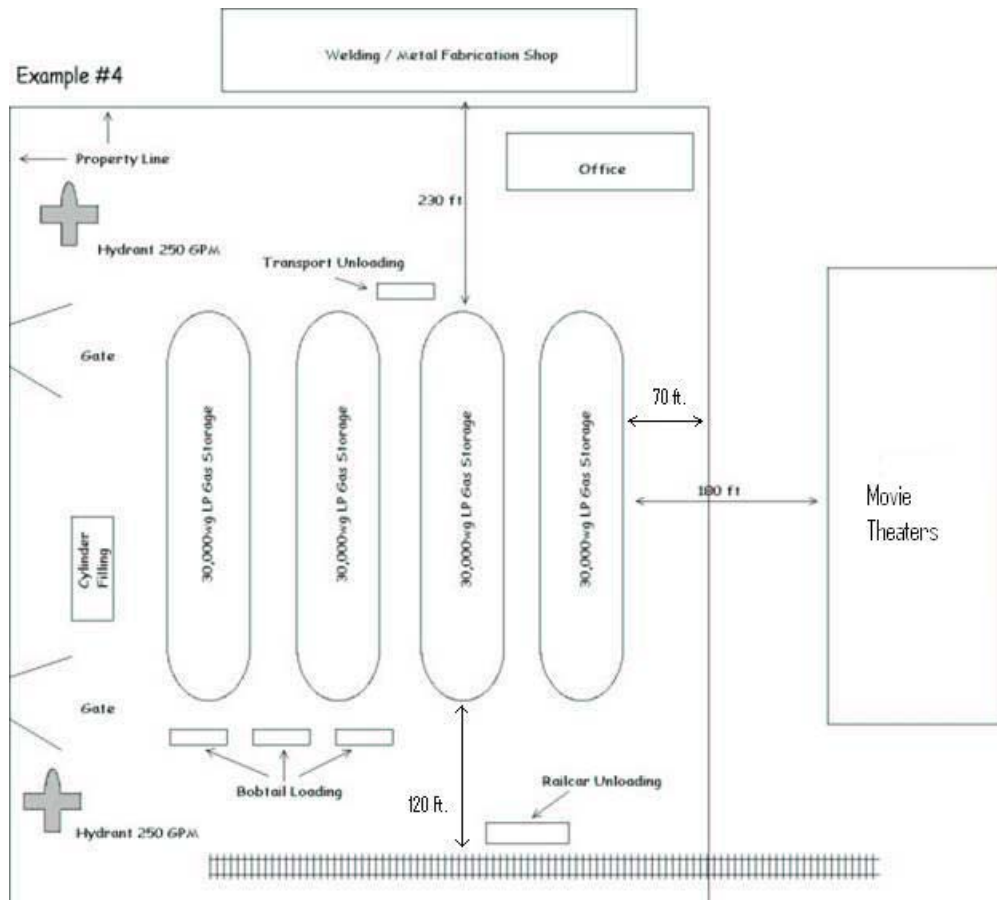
Schematic plan view of a LP-Gas facility used in Example 4
